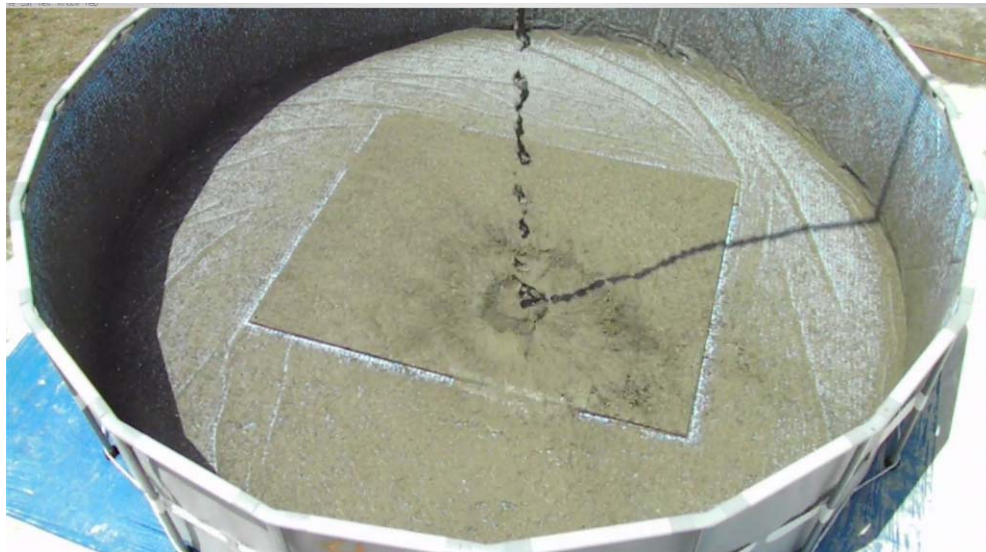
Photo of the grout impacting the steel plate at the start of Test 3B
